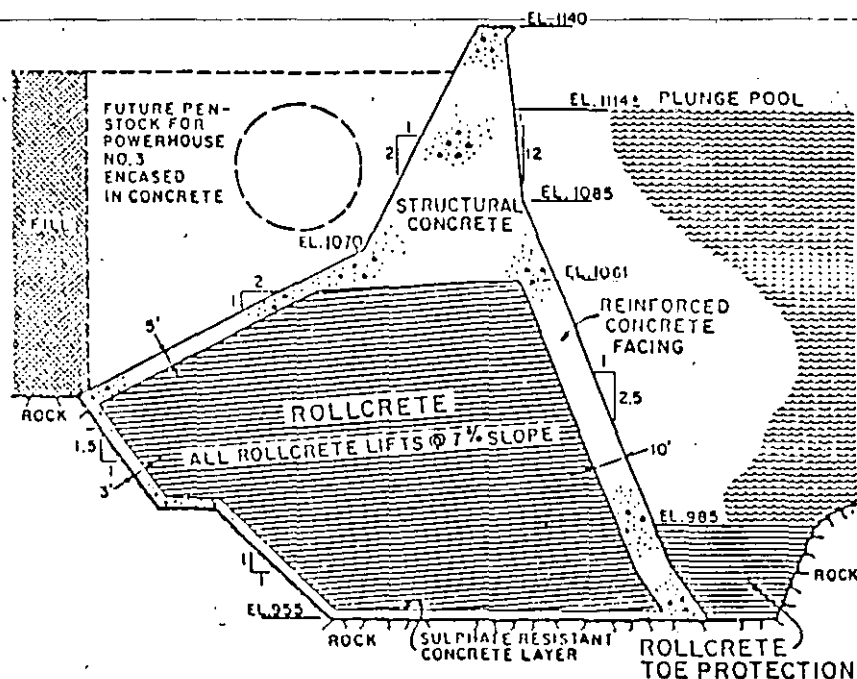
Cross-section of Rollcrete/Conventional Concrete Gravity Wall Between Tunnel 4 Plunge Pool and Powerhouse Area, Tarbela Dam Project
